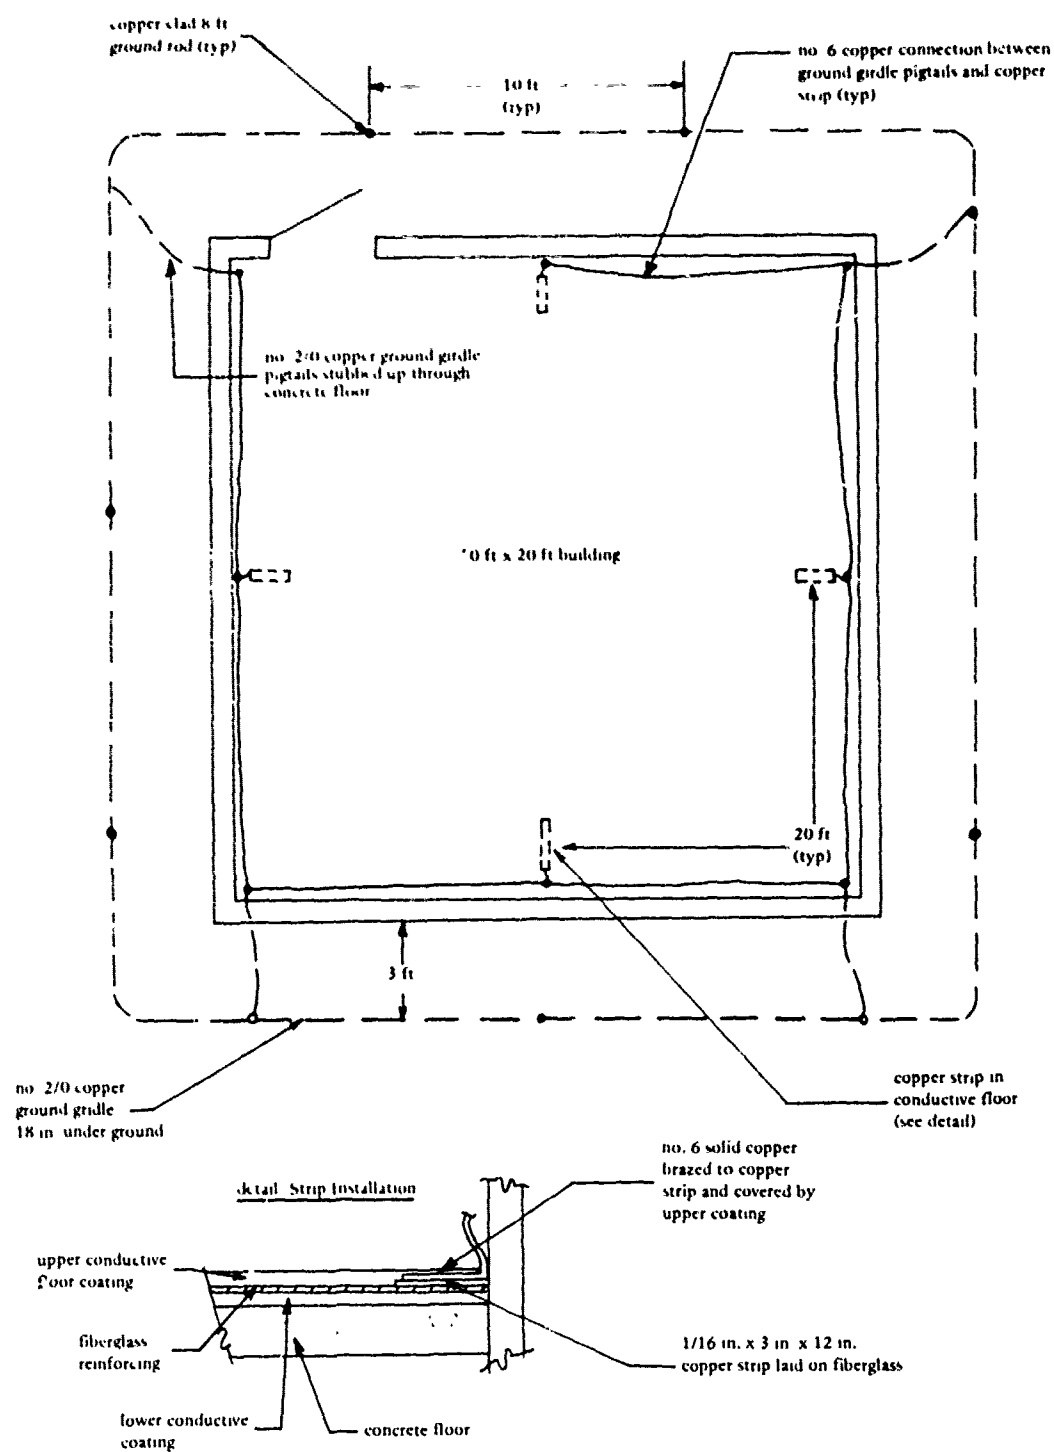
Conductive floor coating and grounding installation diagram used in original construction at NOS, Indian Head.
